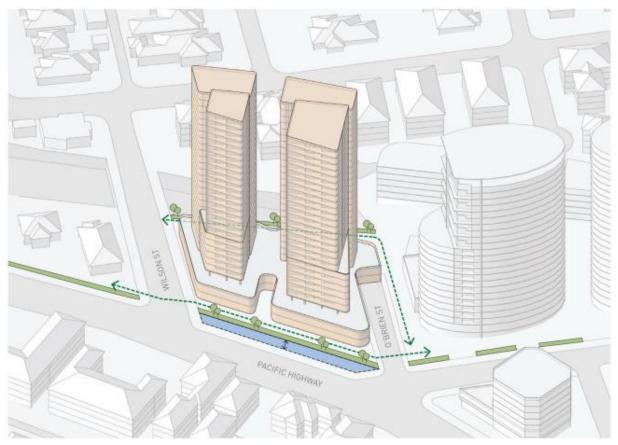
Indicative Concept plan (source: Gyde planning proposal)
